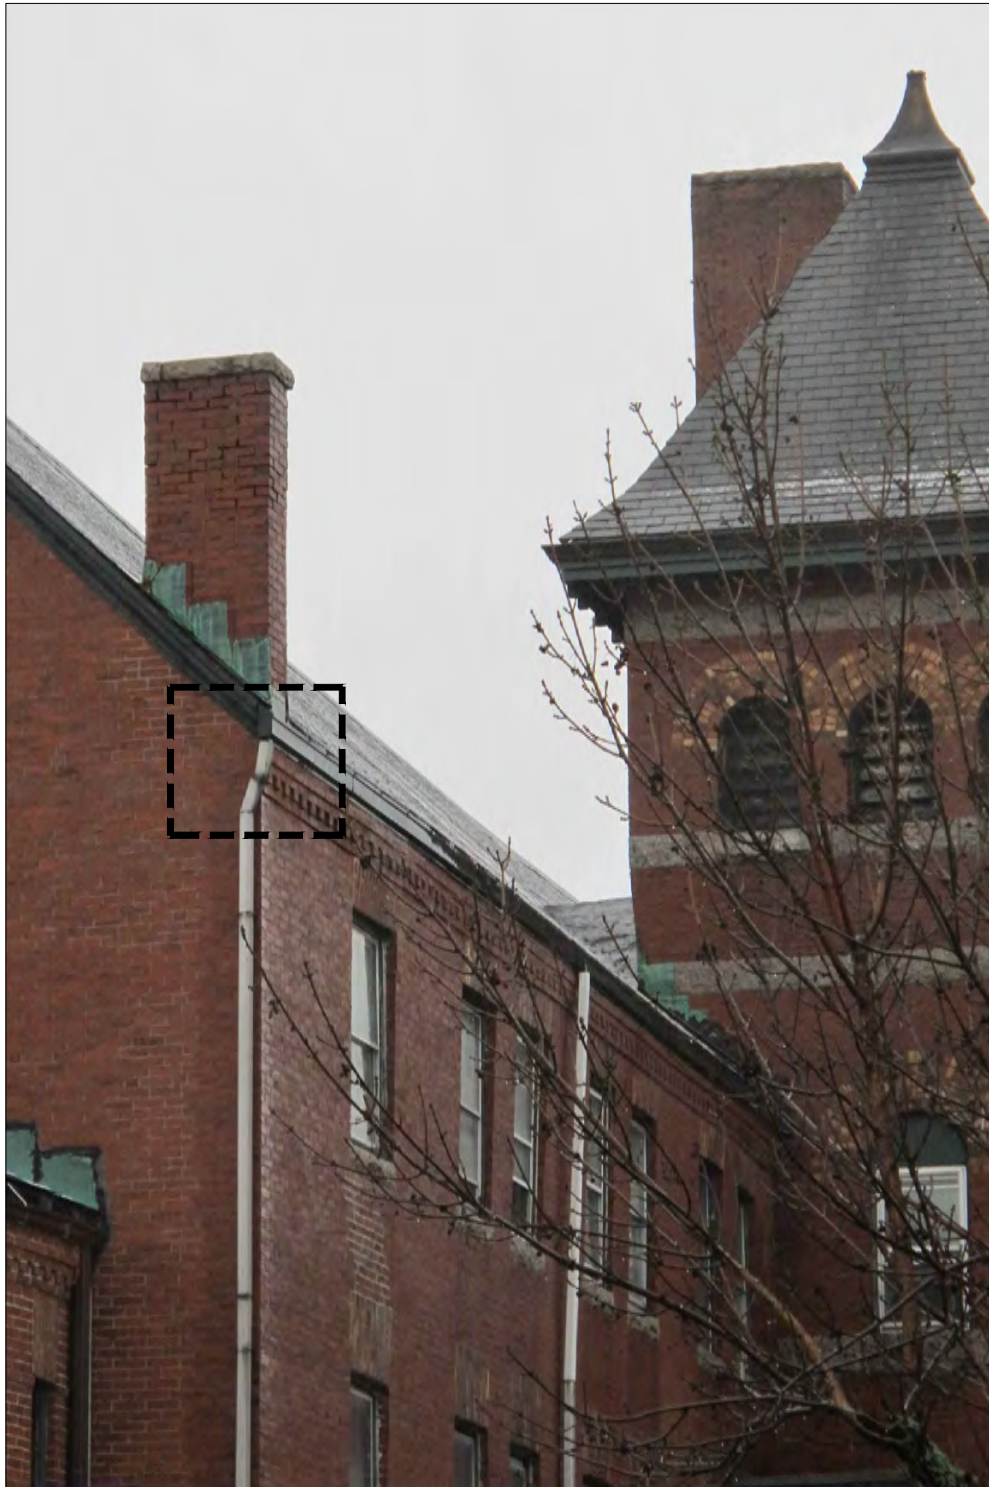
/DRAWING D-201: Rake to gutter transition at northeast corner of building.
